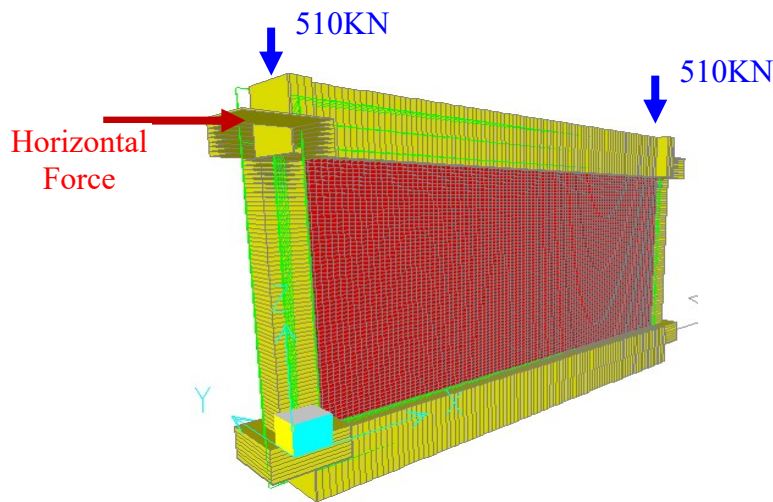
Single-storey one bay R/C frame with the encased R/C panel
